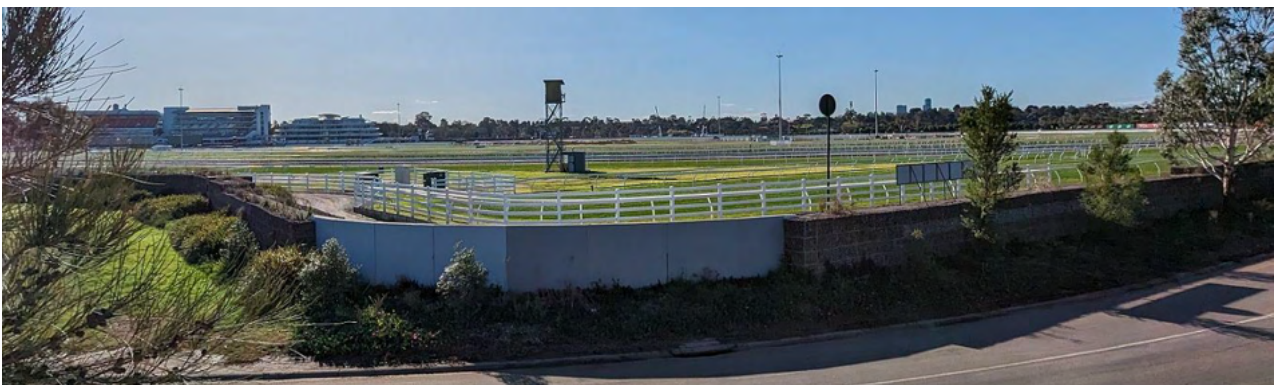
Picture of the VRC flood wall taken at the southern edge of the wall, along Chiquita Drive, looking north.
